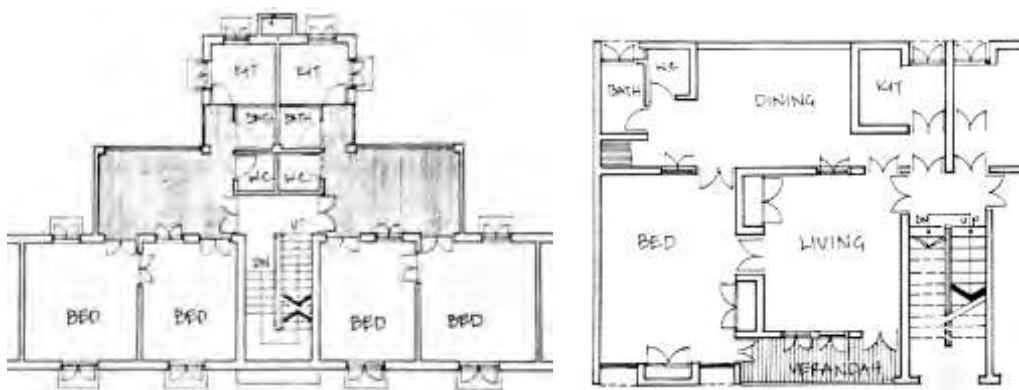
Spatial Pattern: Spread Layout type (left) and Compact Layout type (right)
